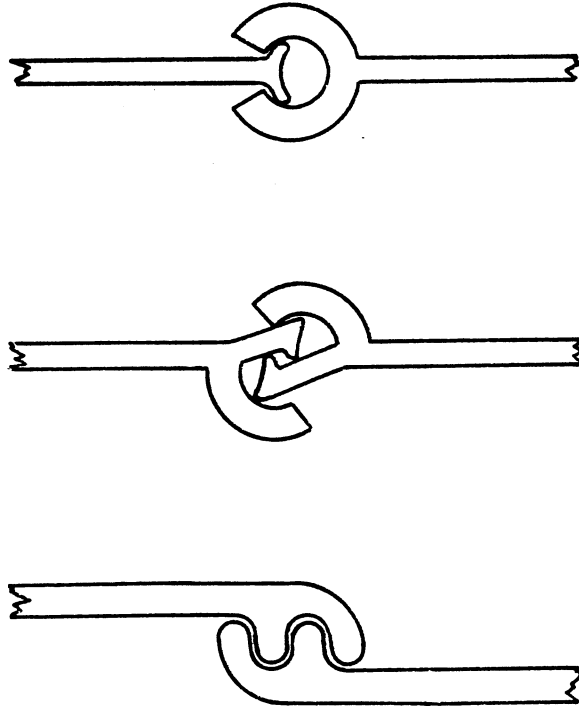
Steel Sheet Piling Interlock Designs (Adapted from: Merriman and Wiggin 1947)
